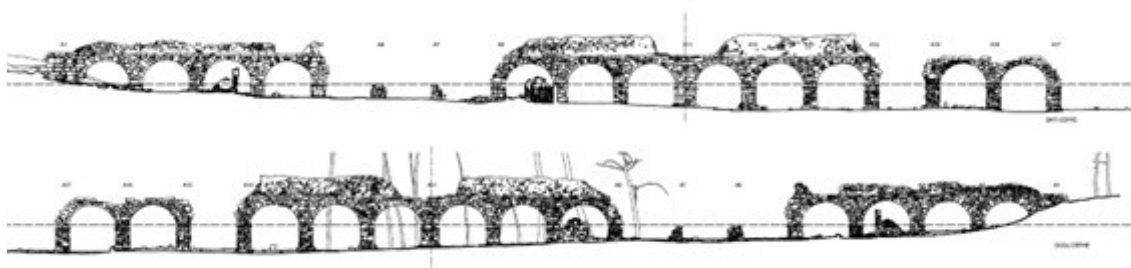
East and West Elevations of the Central Harbor Aqueduct
